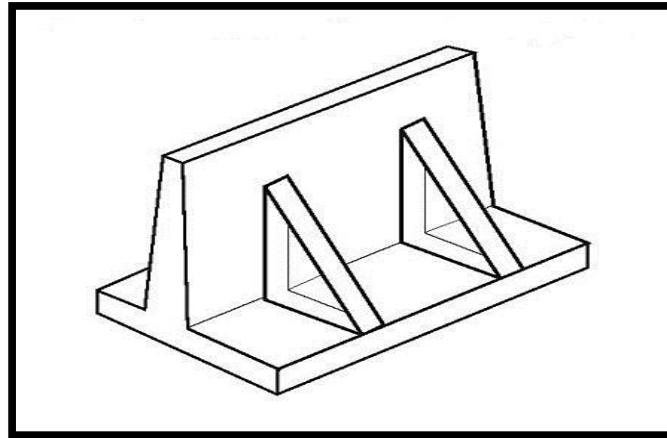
Cantilever wall with Counterfort/Buttress. (<http://www.wikiwand.com/>)
